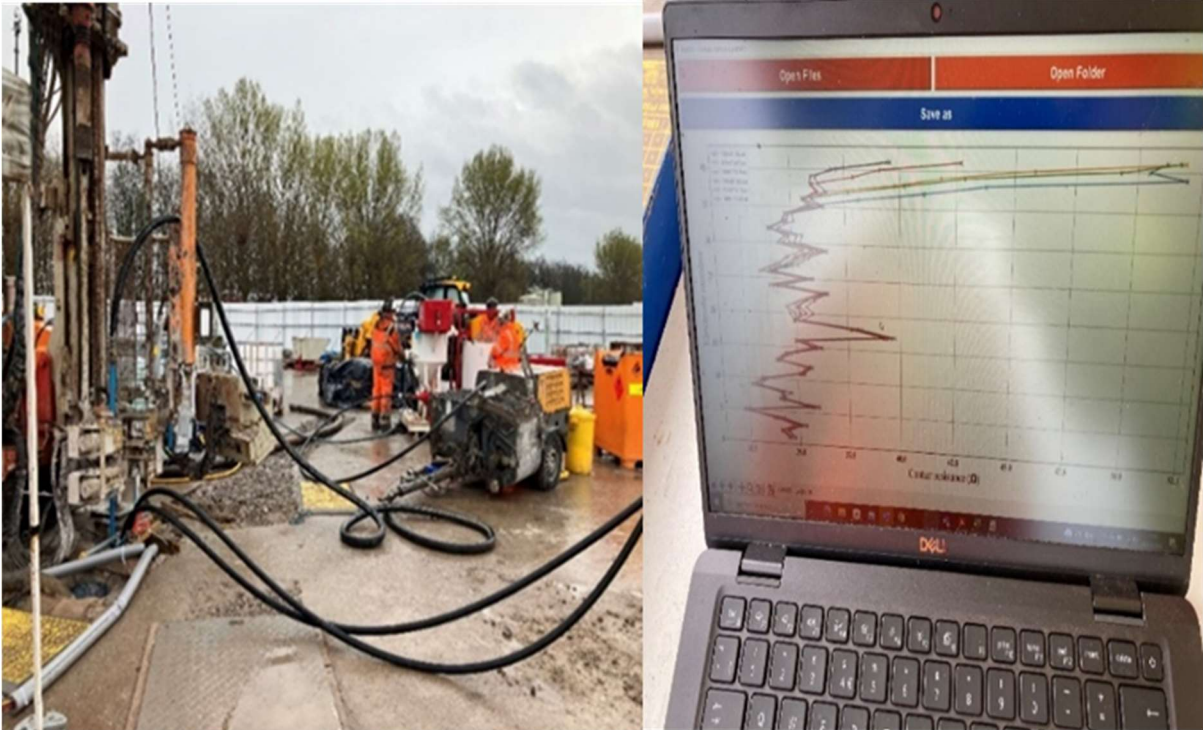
Grouting setup at TH0417 showing both mixing units and the ERT trace showing clear grout migration up the well with no returns at surface
